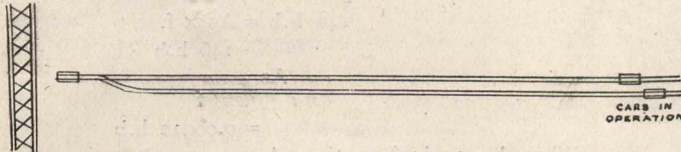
Street Rails with Load Some Distance from Structural Ironwork.
